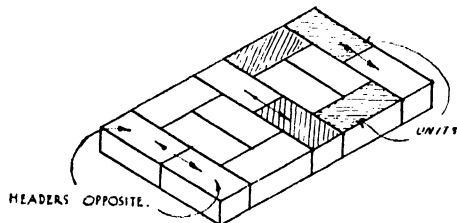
TWO-BRICK WALL IN FLEMISH BOND
